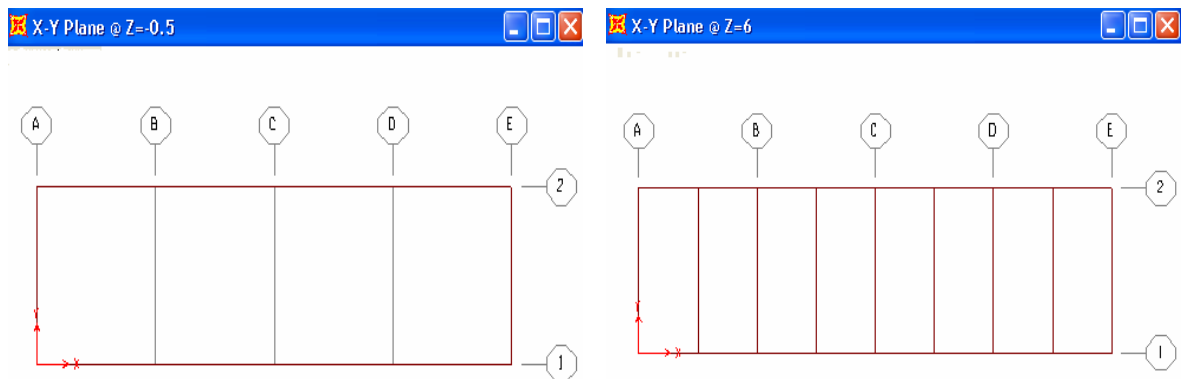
The Plan View of the building at an Elevation of -.5m and 6 m respectively
